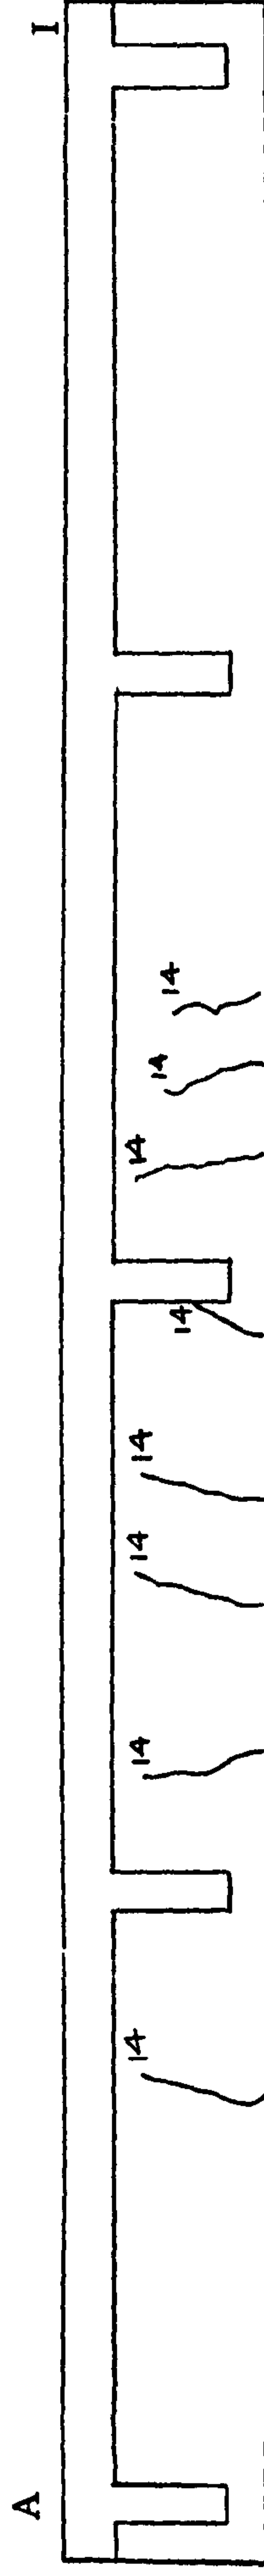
(d)-Crack Pattern on the Sides of Beam #4 of the Model Bridge Deck
